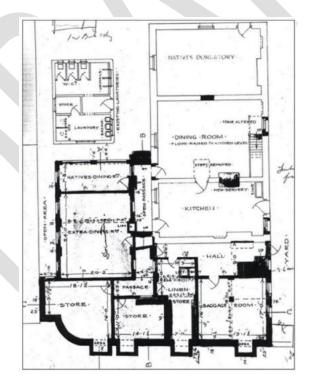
1925 Basement Plan showing the proposed alterations to the original wing, including the infill of the opening in the wall between the "Natives Dormitory" and "Dining Room", alteration of the stair on the southern wall and addition of a servery between the "Dining Room" and "Kitchen". The proposed additions are clearly evident, with notable features including the two "lifts" (dumb waiters) and "shoot". Note the 1922, existing Lavatory Block. (Source: City of Sydney Archives, 0540/25)
